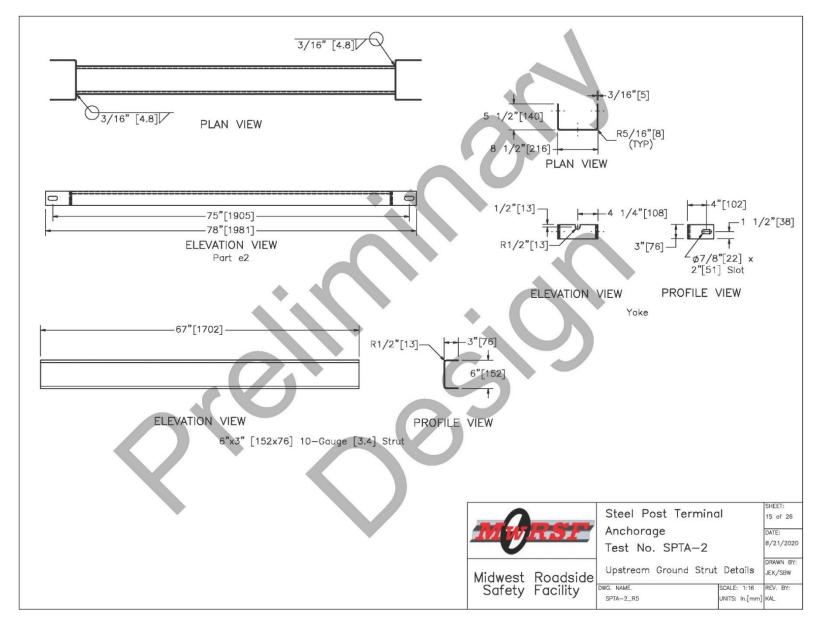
Upstream Ground Strut Details, Test No. SPTA-2
